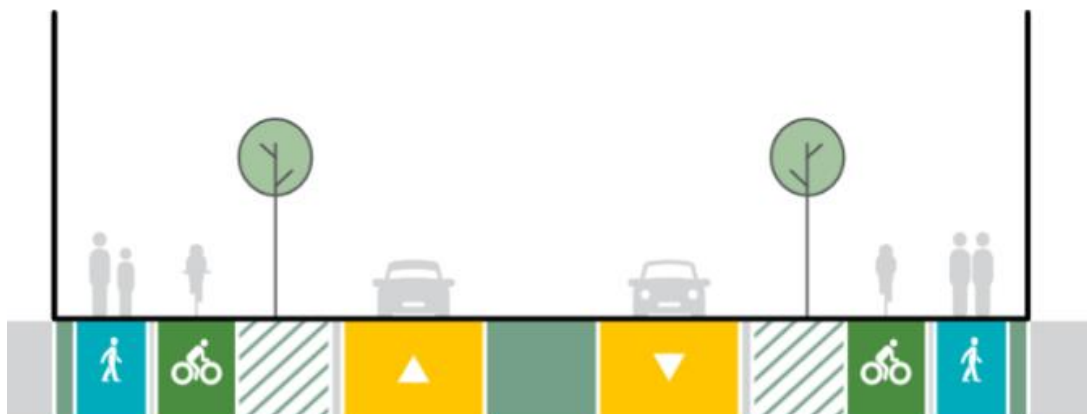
Proposed cross section of new roadway demonstrating ability to plant new street trees in a berm area.
